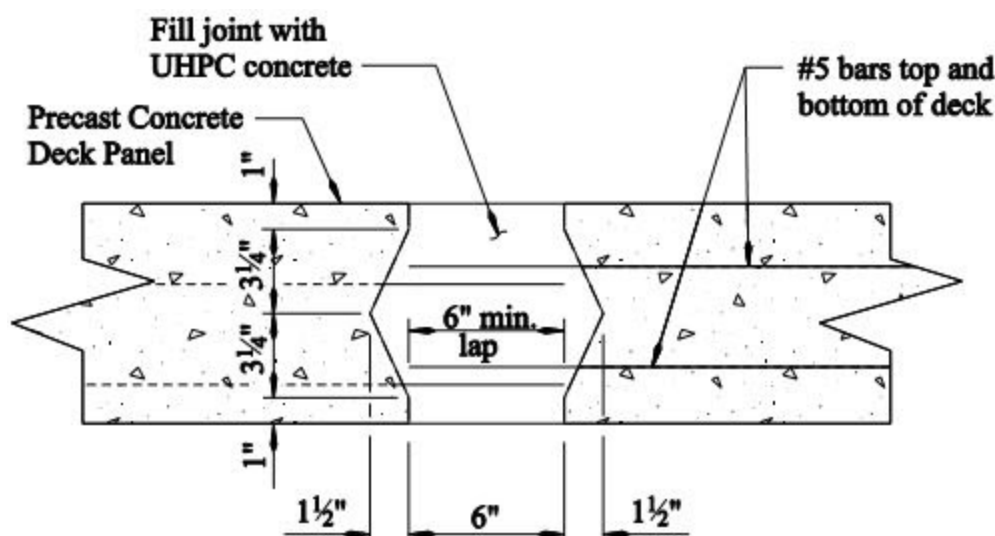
UHPC Connection With Precast Concrete Deck Panel [18]
